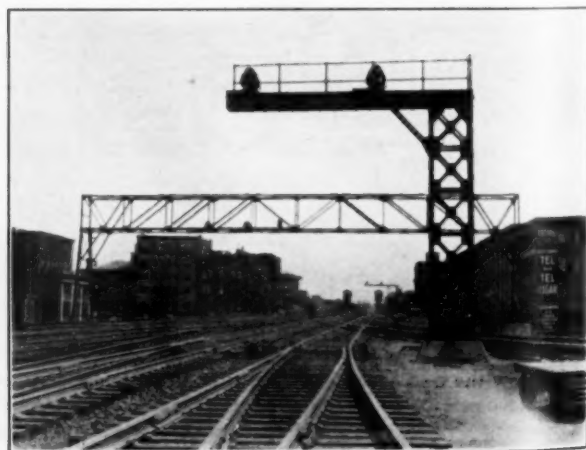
WEST END OF TRACK LAYOUT LOOKING EAST FROM CONNECTICUT RIVER
